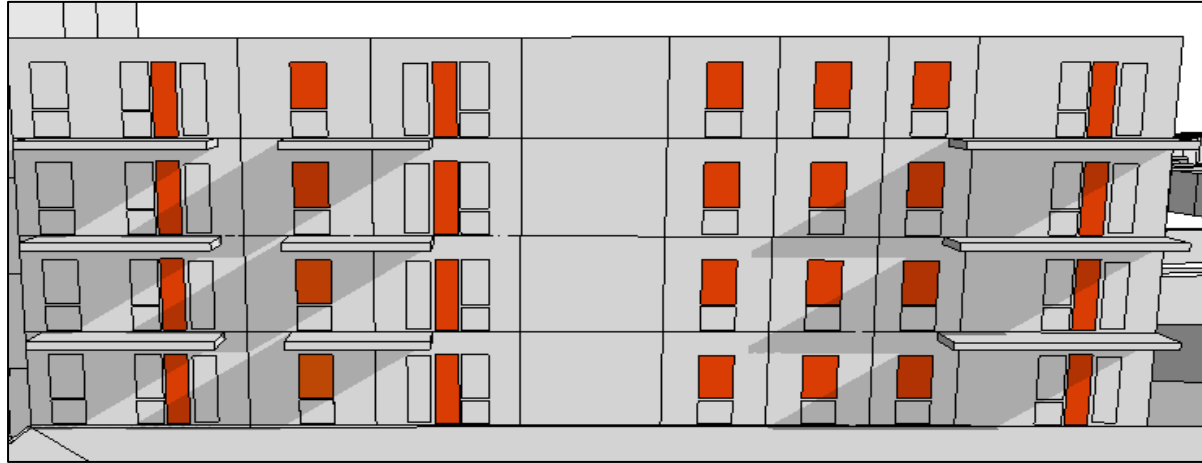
Windows achieving 1.5 hours of sunlight - Southwest elevation of Building 2A (modelling software)
